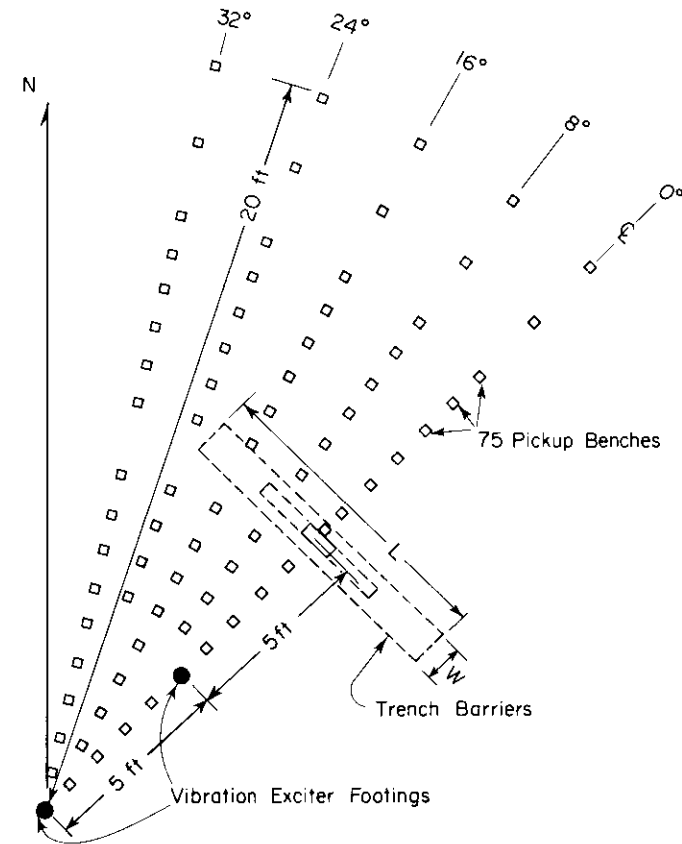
Plan view of field-site layout for passive isolation (from Woods, 1968).
